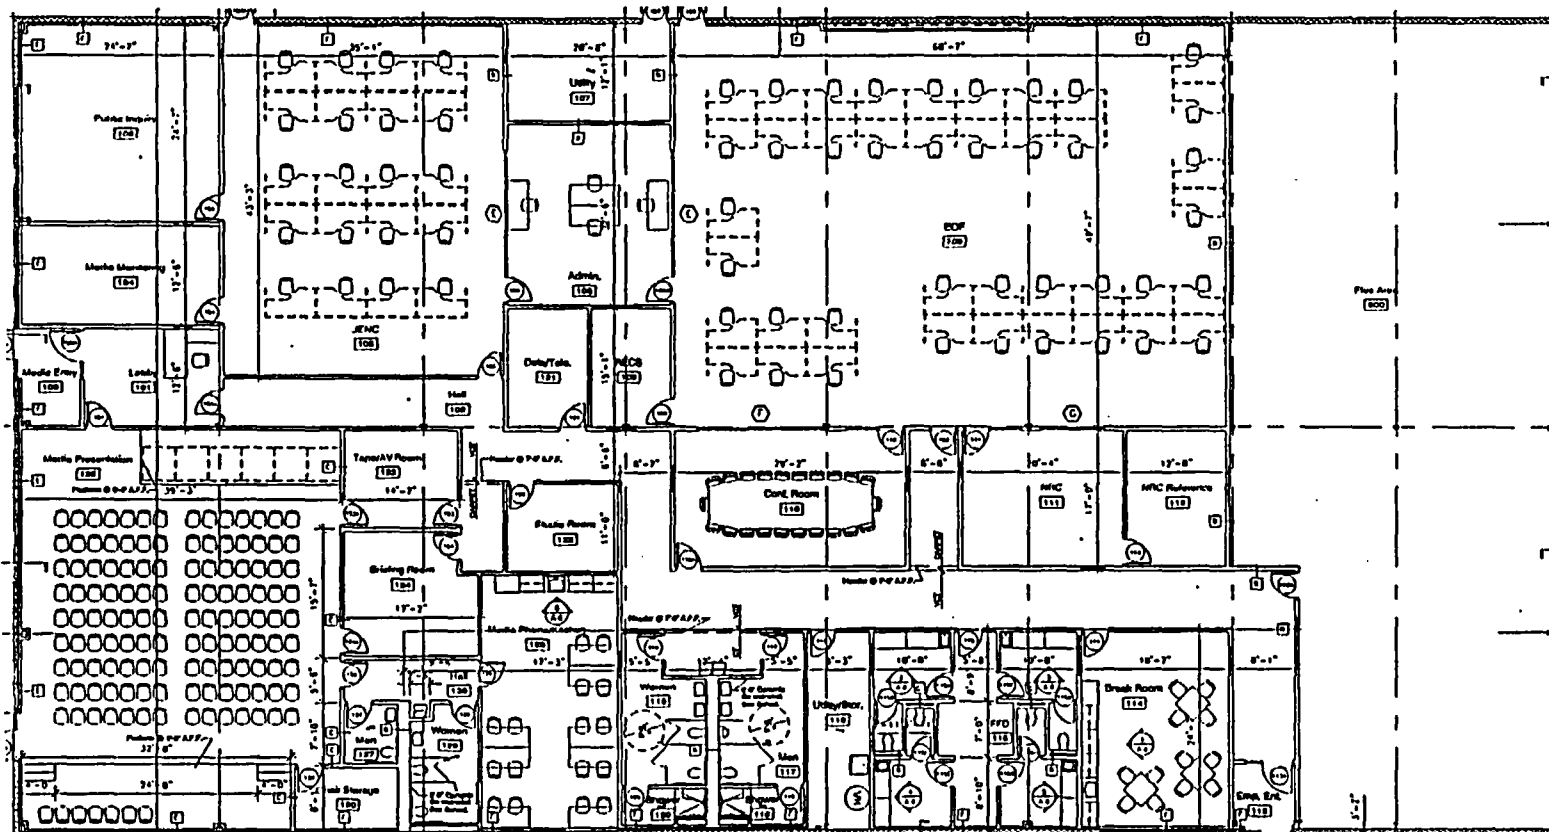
EMERGENCY OPERATIONS FACILITY / JOINT EMERGENCY NEWS CENTER FLOOR PLAN
